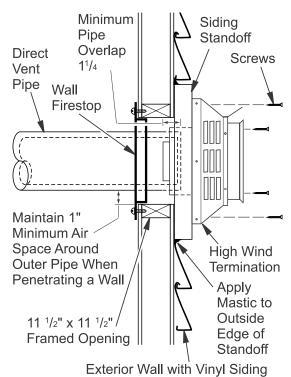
Typical Horizontal Termination Cap Mounting with Additional Siding Standoff Installed
